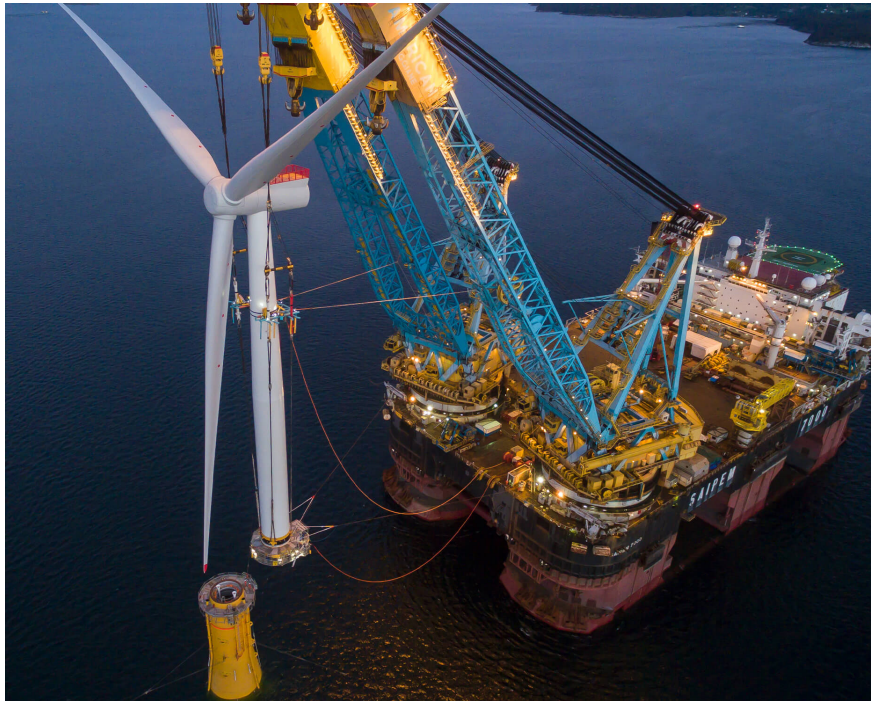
Mating of the tower assembly with the spar platform performed by a crane vessel [3].
